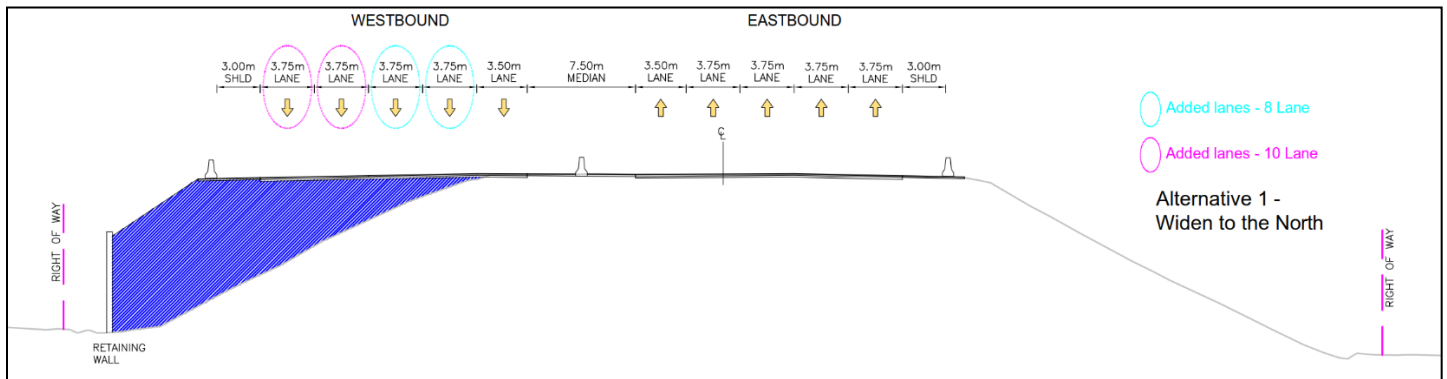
Cross Section for Section 1 – Extend Fully to the North (10-Lane)
